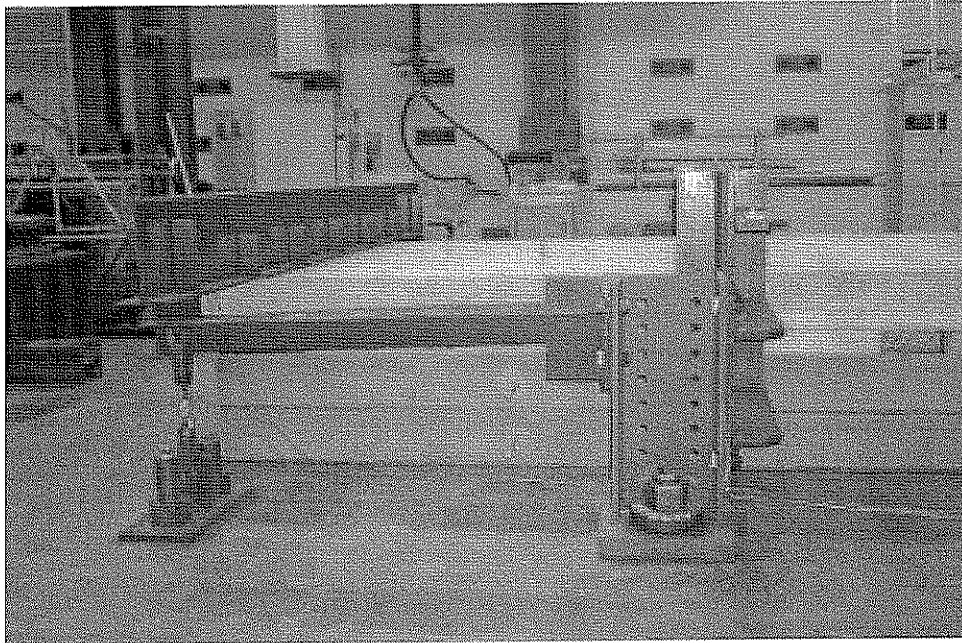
Assembly of the south end of the fixture with a test panel in place.
